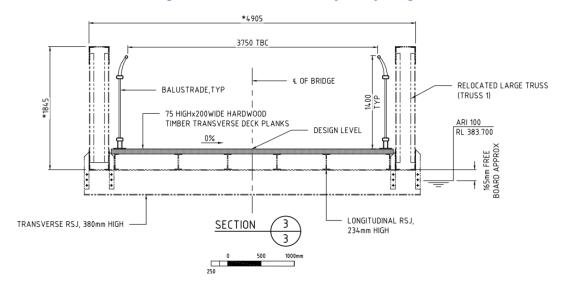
Relocated steel truss span for TGGP cycleway bridge
